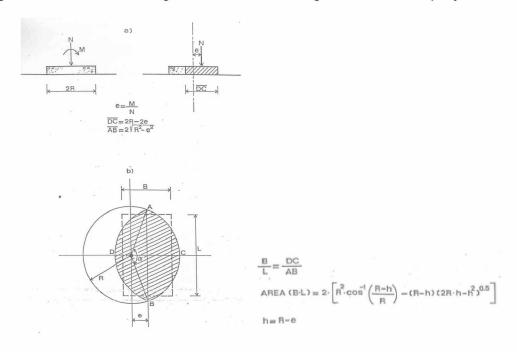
Effective footing dimensions for circular foundations (Meyerhof 1953).
